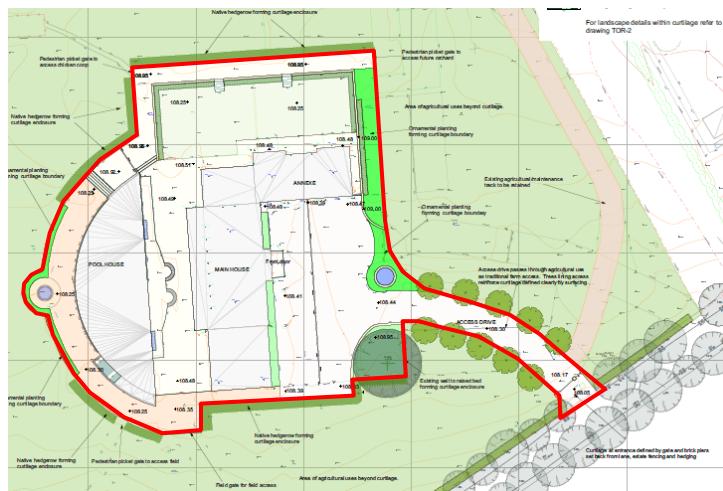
Screen grab of proposed curtilage plan TOR-4 REV-A.
